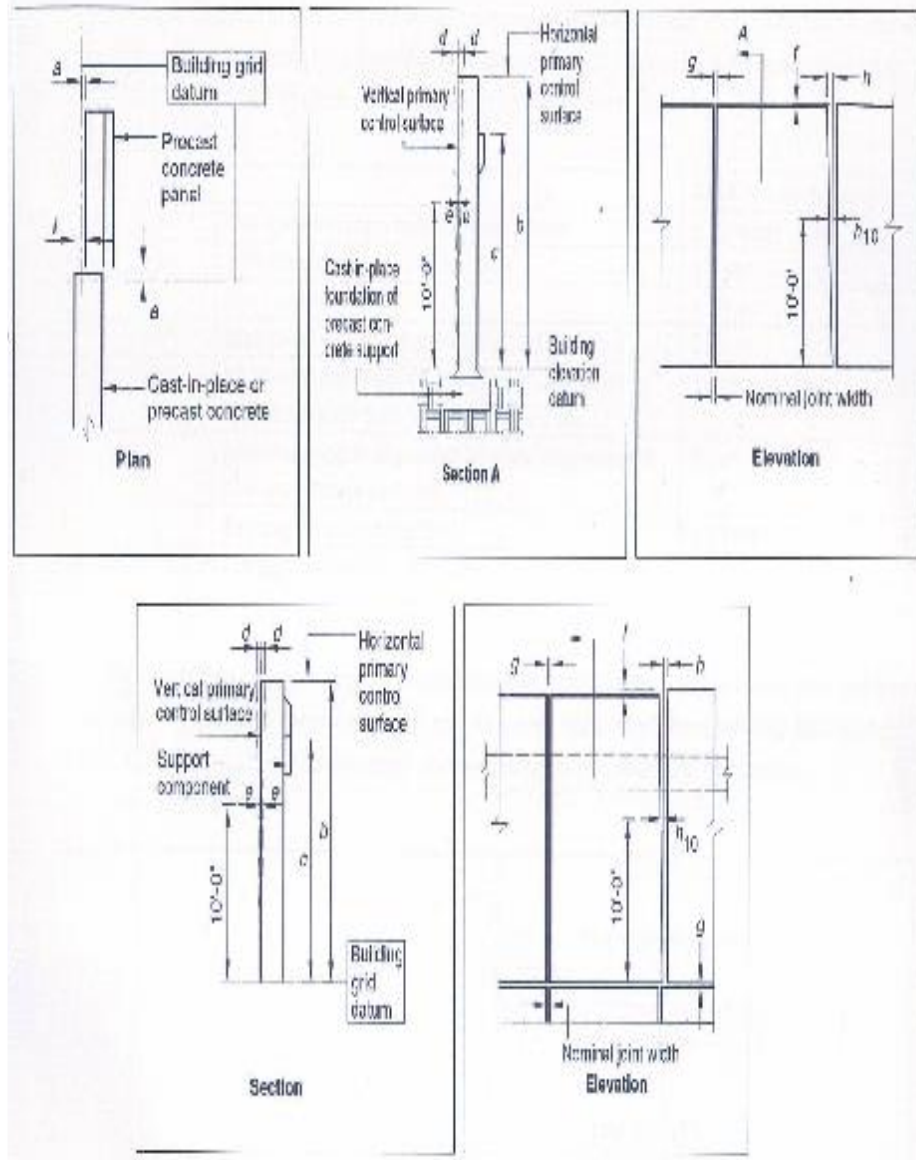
Structural Wall Panel Erection Tolerances
